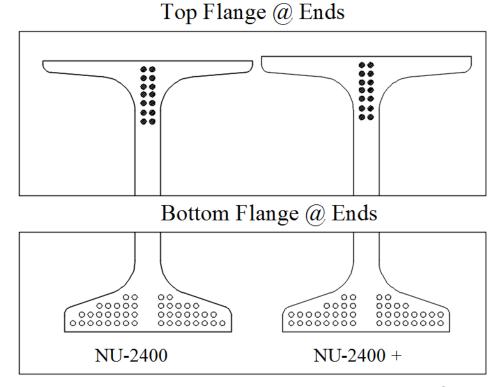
Harped Strand Pattern of NU-2400 Girders with 8-ft Spacing @ Maximum Span Length
